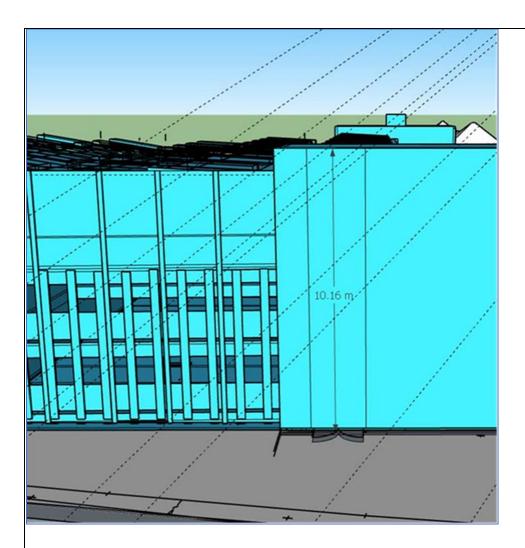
Staircase on the west elevation of the building taken from VTX-STL-X-ZZ-DR-A-XXXX-0201 Revision PL01
